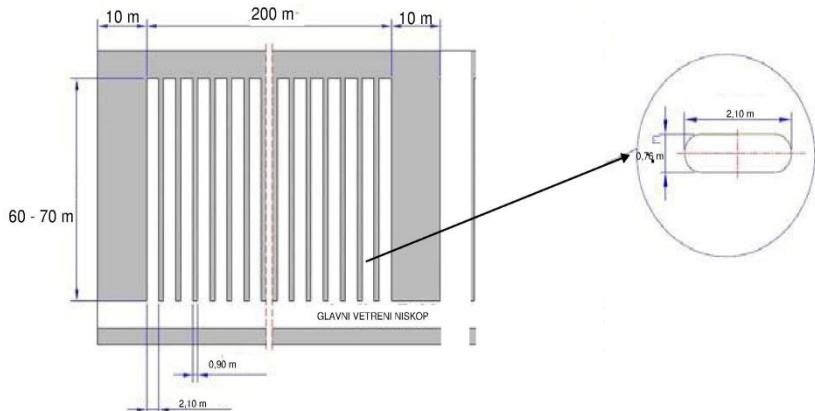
View of excavation field geometry in exploitation with drilling machines in the BCM Bogovina
